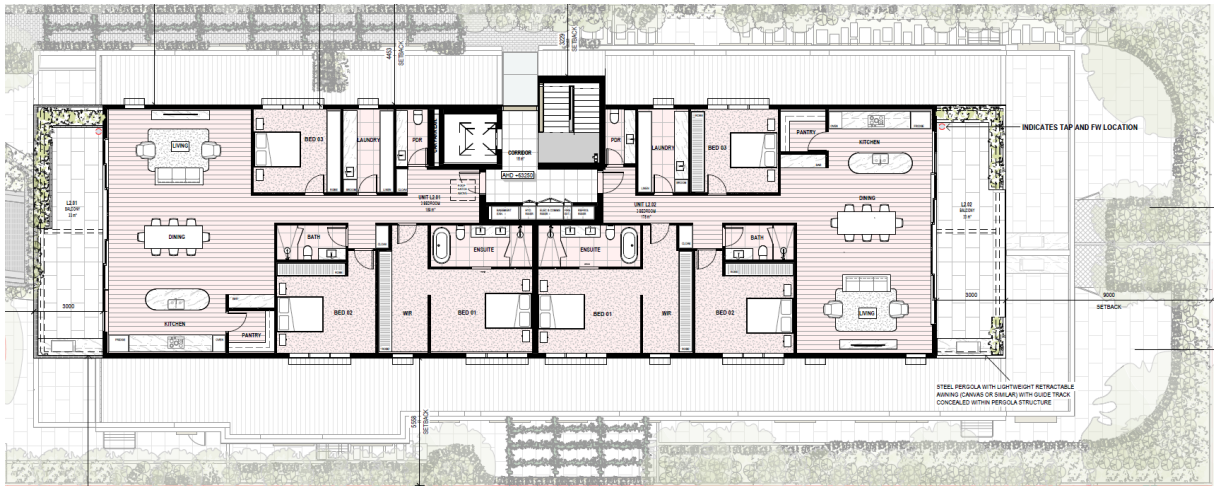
Level 2 Plan (Previous (VCAT PNPE9) Design)
